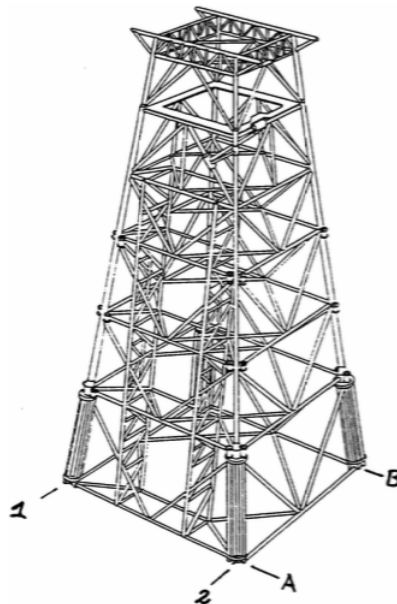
Concept Sketch of a Steel Jacket (Amdahl, 2009)
